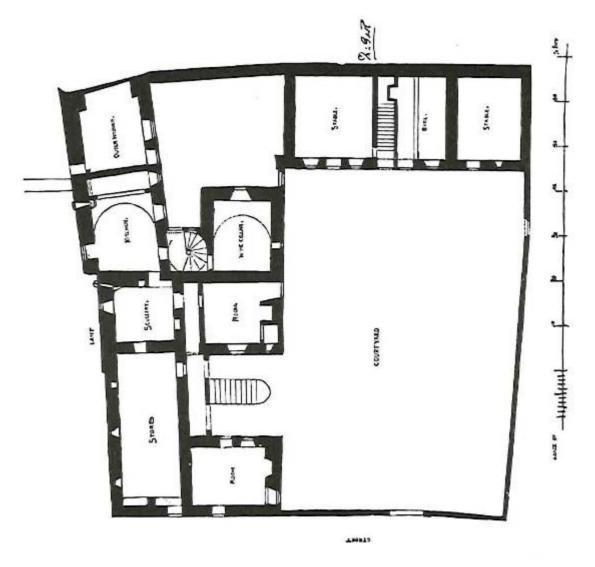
Plan by MacGibbon & Ross, published 1887: ground floor.
